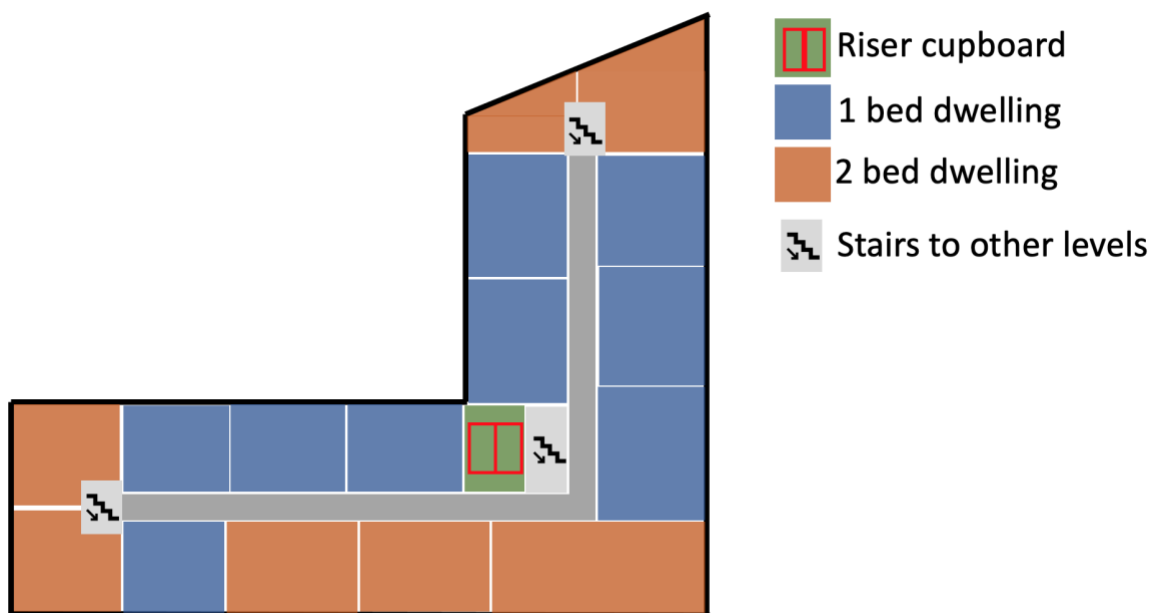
Floor plan showing dwellings, riser cupboard and stairs on one floor. This plan applies to all floors.
